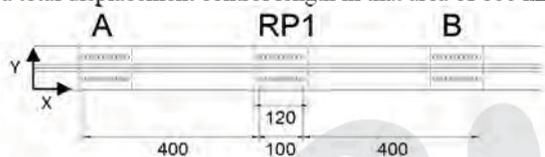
Top view of the instrumentation layout in the cutting zone (Units in mm)
